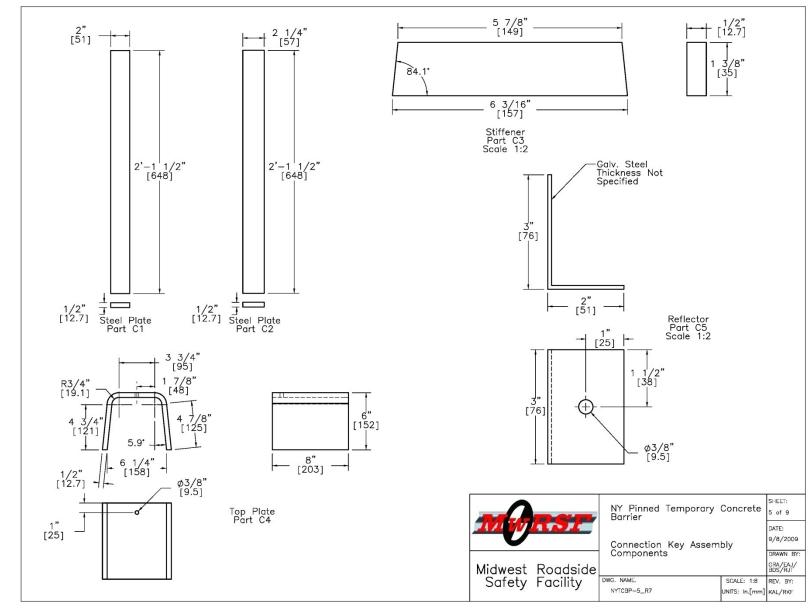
Connection Key Assembly Details, Test No. NYTCB-5
